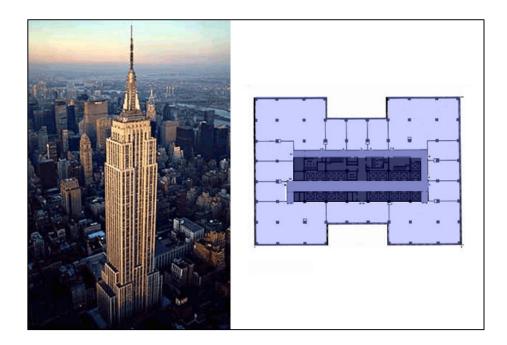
Empire State building - general view and typical floor plan (google images)
